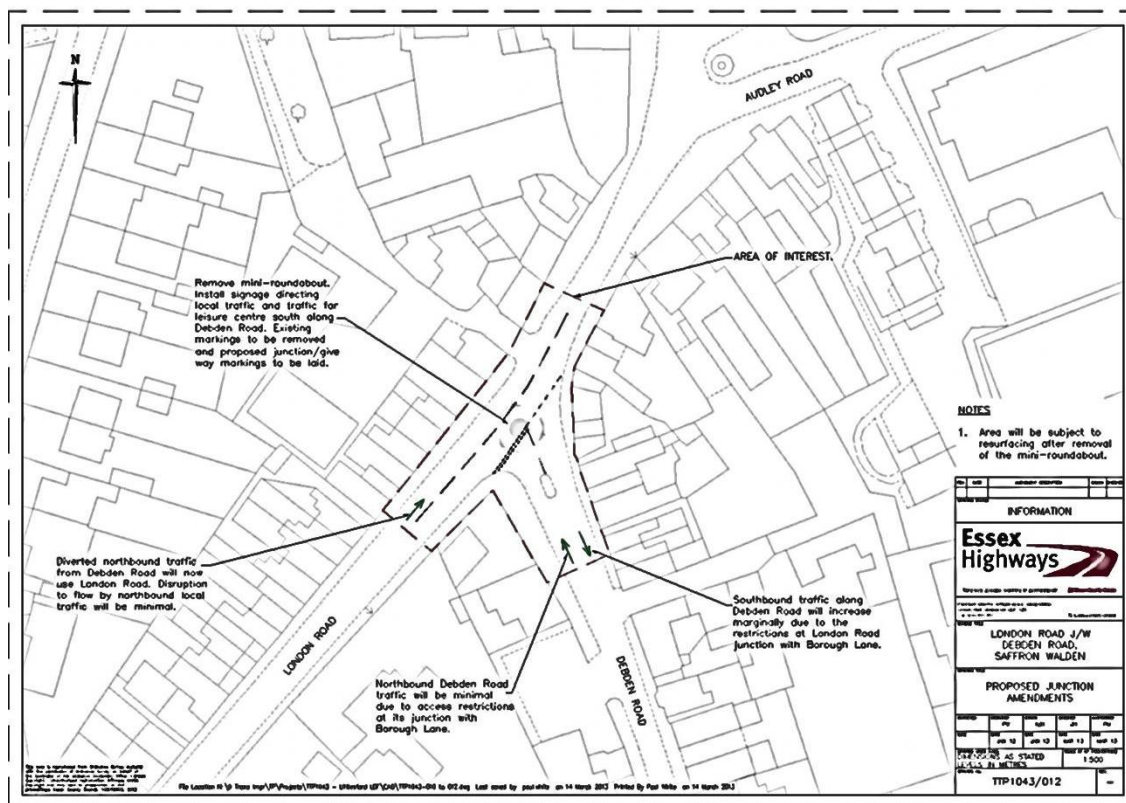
Debden Road / London Road junction with priority layout (MM6)
